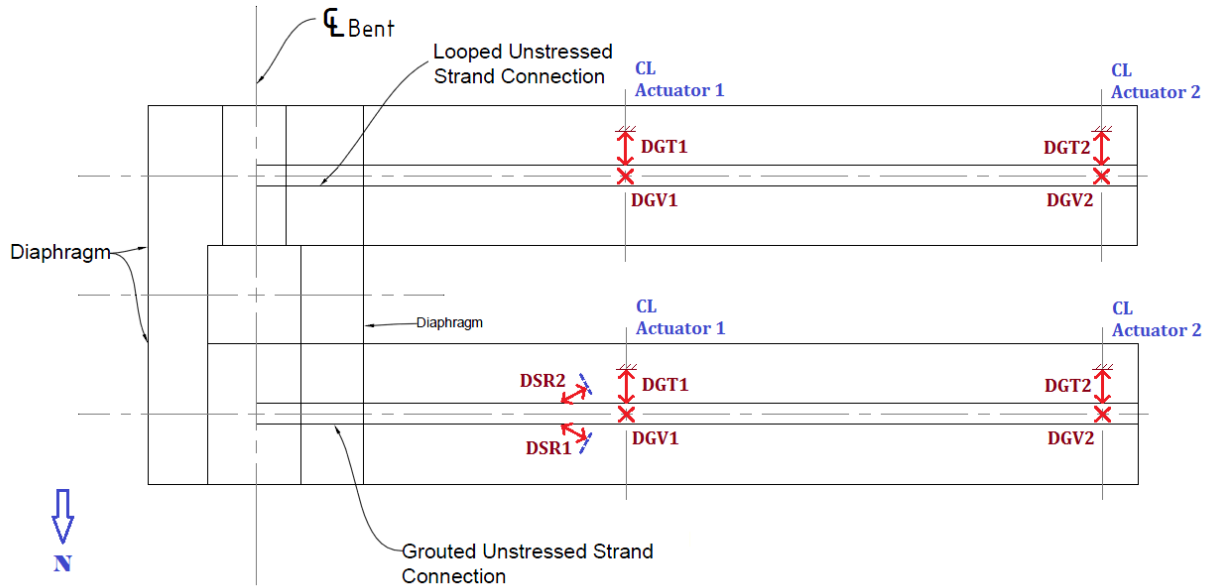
Displacement transducers on girders for GUSC and LUSC details (plan)
